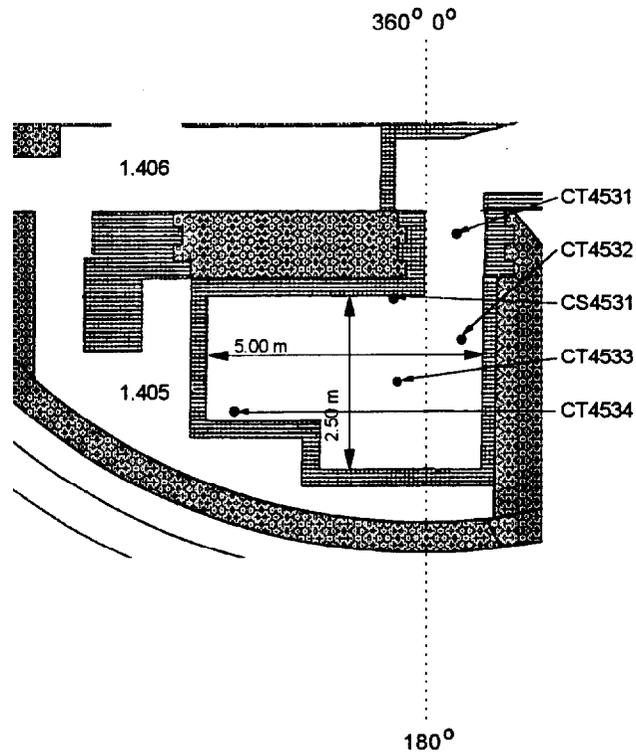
Fire Room at the +1.1 m Elevation for T51.1
